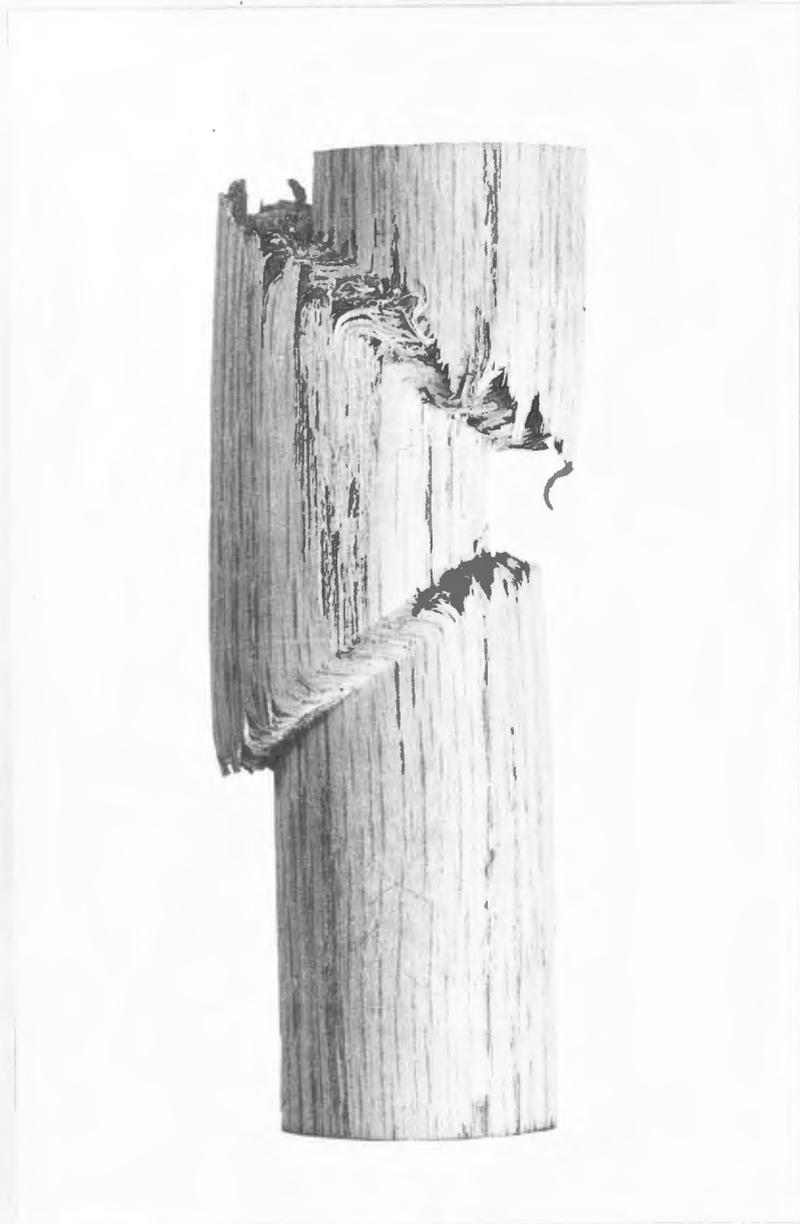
Oak cylinder showing a double failing. Small cross lines in center of bottom segment are fractures.
